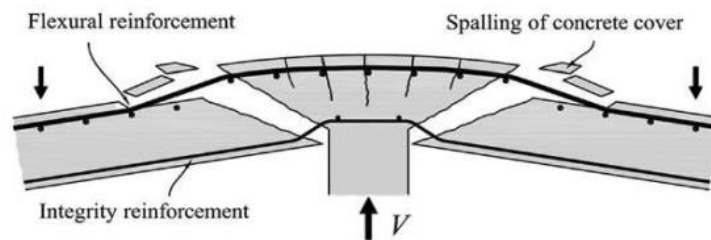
Flat slab failing to punch shear with reinforcement of integrity [38]
